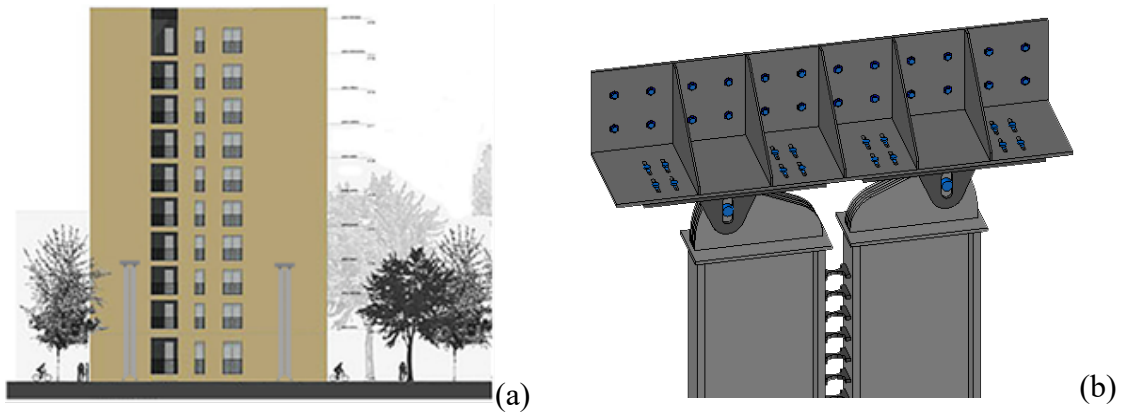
(a) Schematic installation of two DCs linked to the building; (b) Structural detail of the connection.
